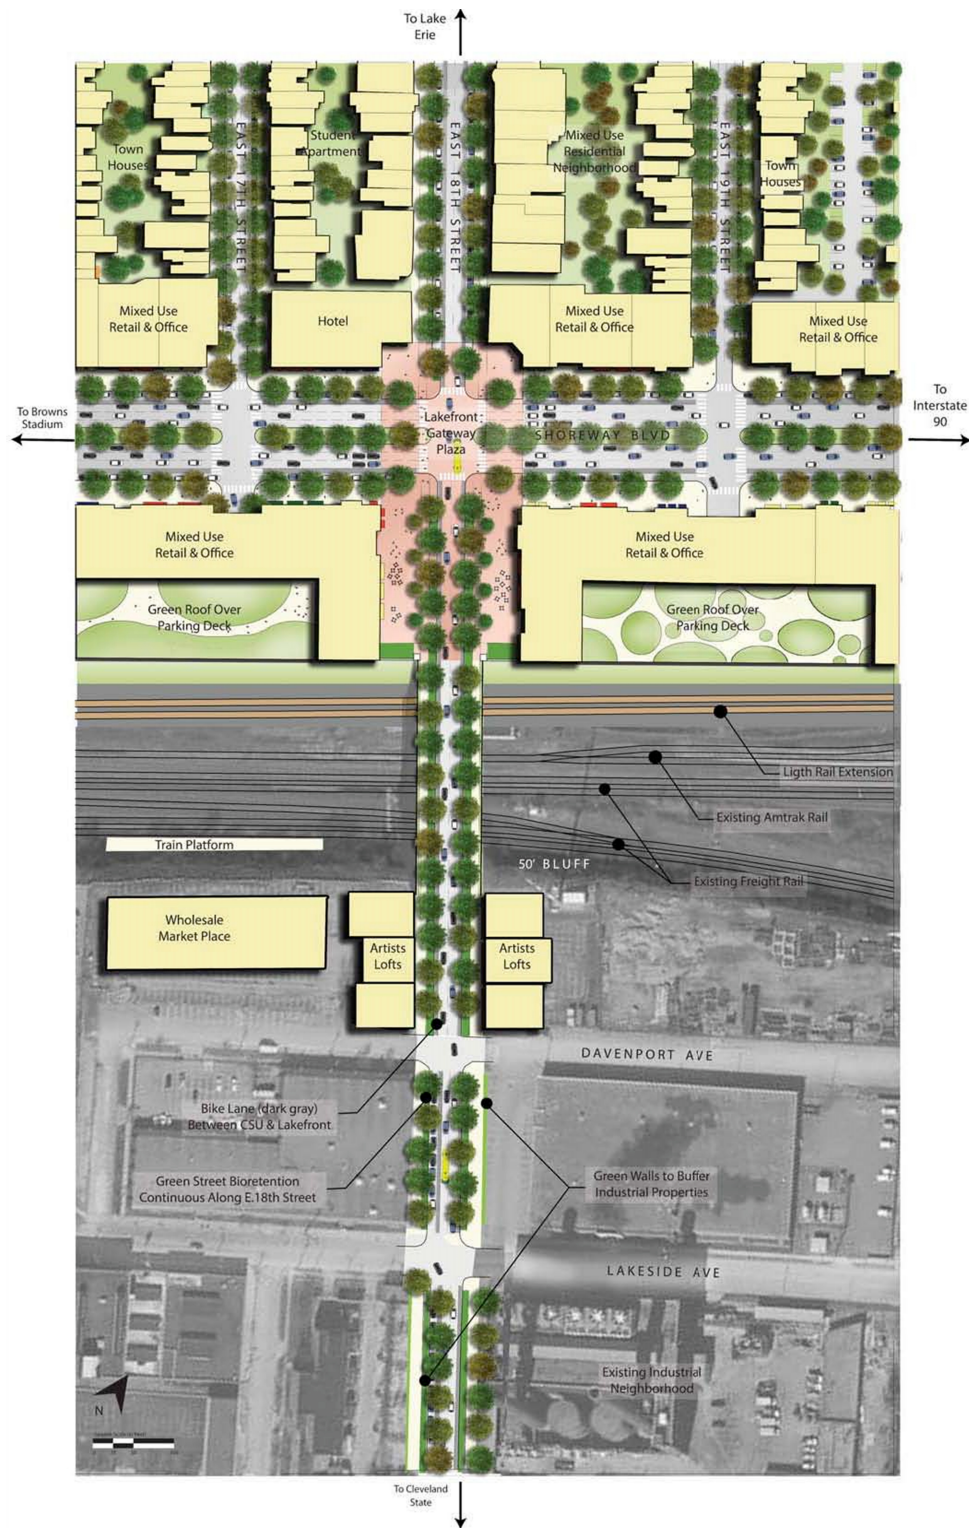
Detail Plan for Intersection of East 18th Street and Shoreway Boulevard (Busa & Cleveland GIS)
